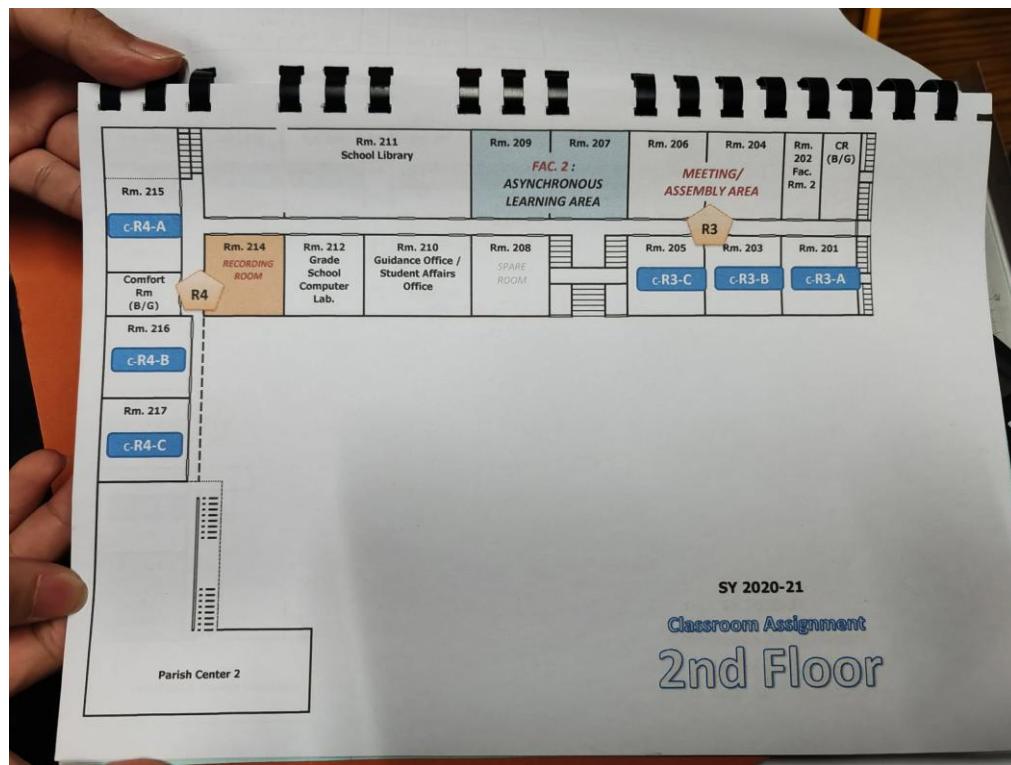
Floor plan of the second floor of NSDAPS' main campus
